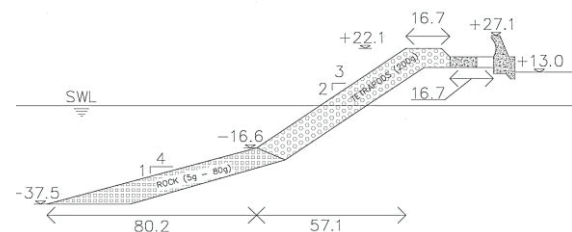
Breakwater cross-section at model scale (Units: cm).
